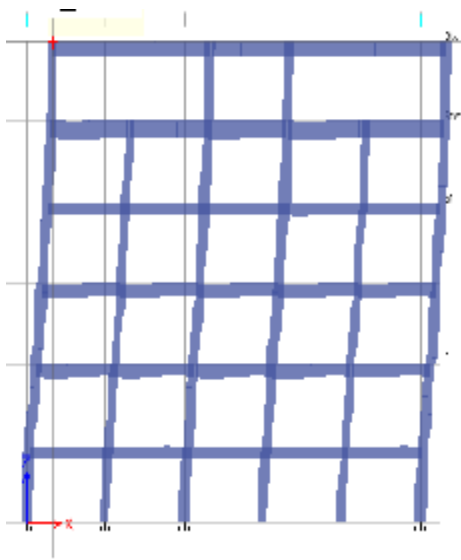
Deformed shape of FC building with increased critical beam and column dimension
